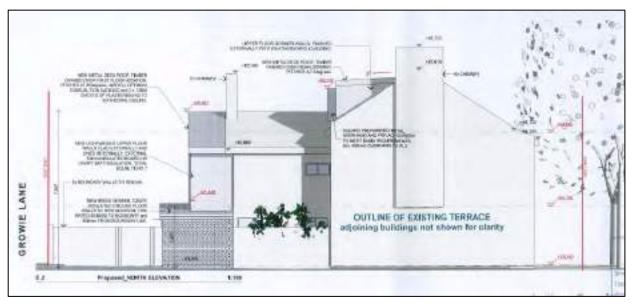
Approved plans of no. 6 Ruthven Street under DA-18/2017, demonstrating the proposal as similar to the subject development. (Source: Hargroves Design Consultants, 2017)
